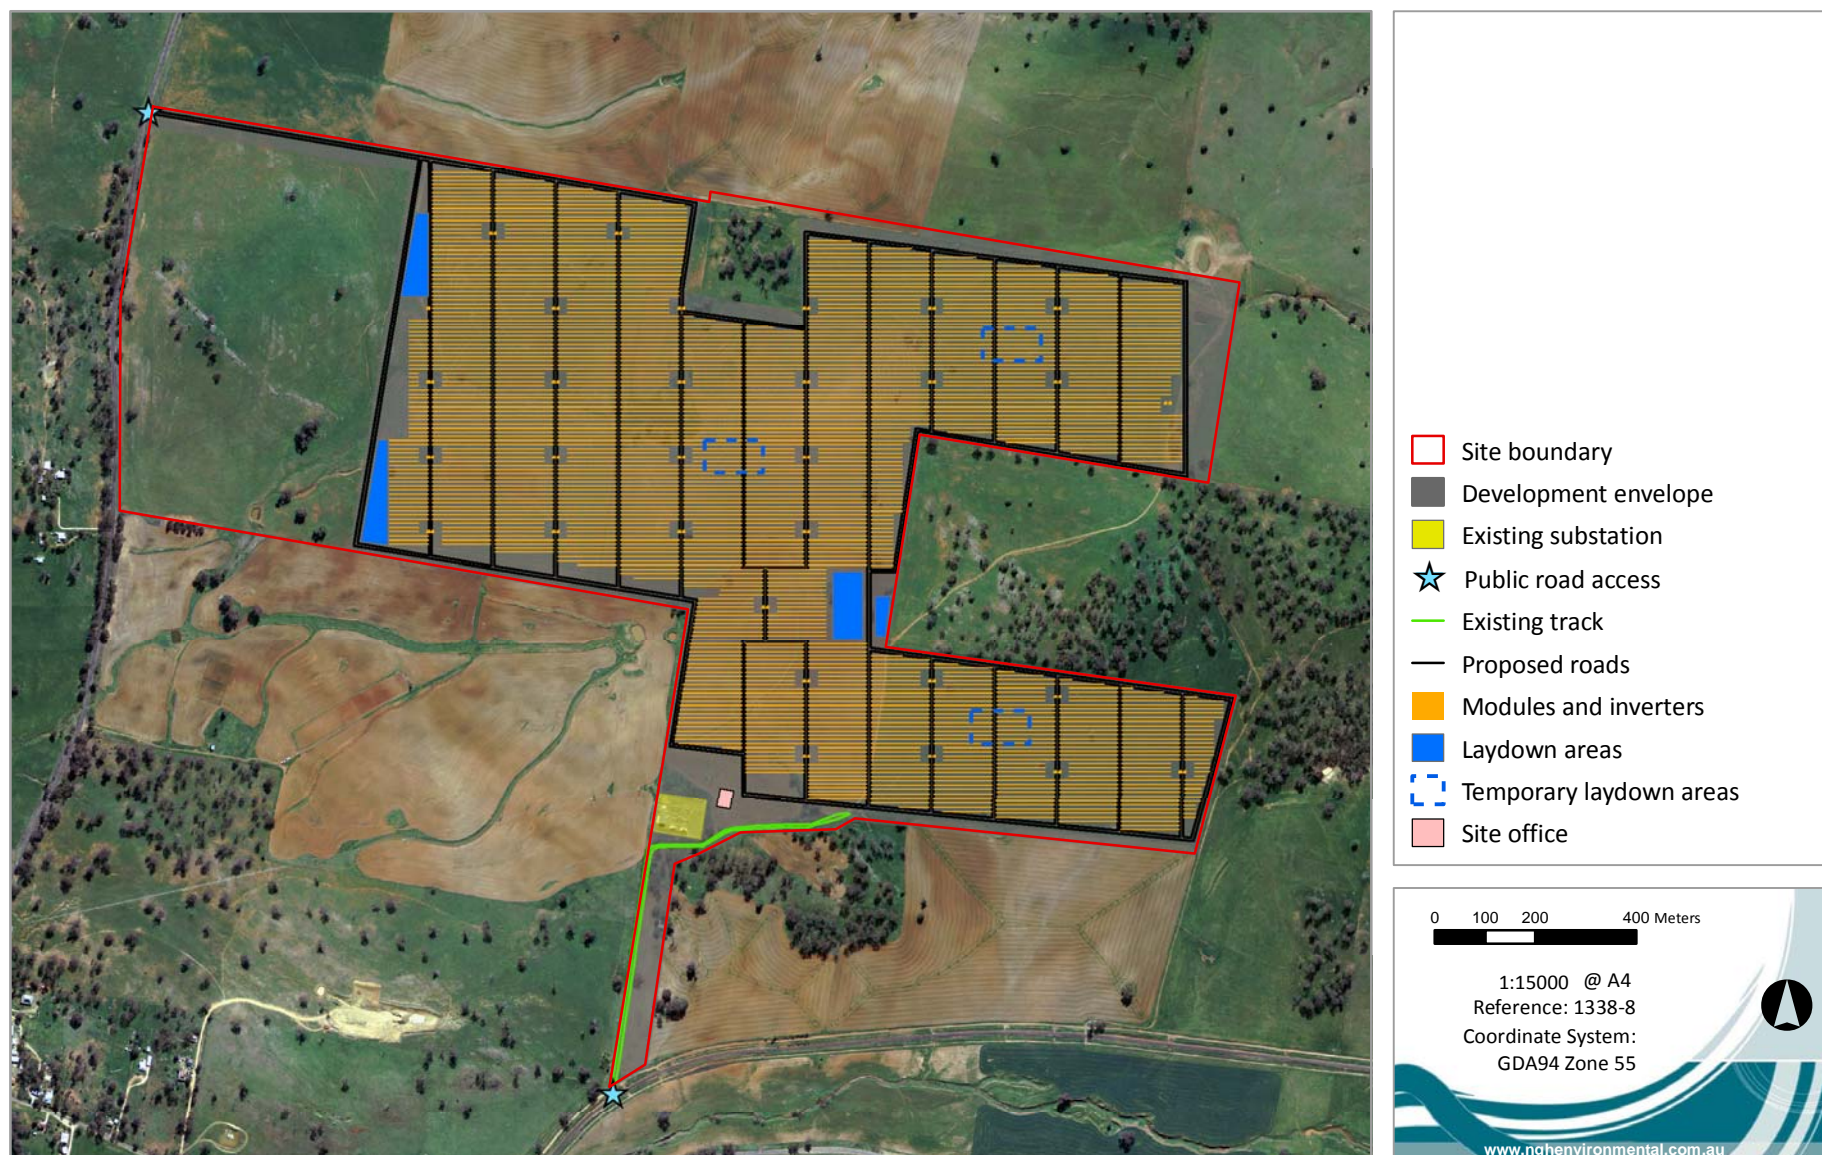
Indicative Manildra Solar Farm layout showing roads, modules and inverters, lay-down areas and site office with the development envelope
